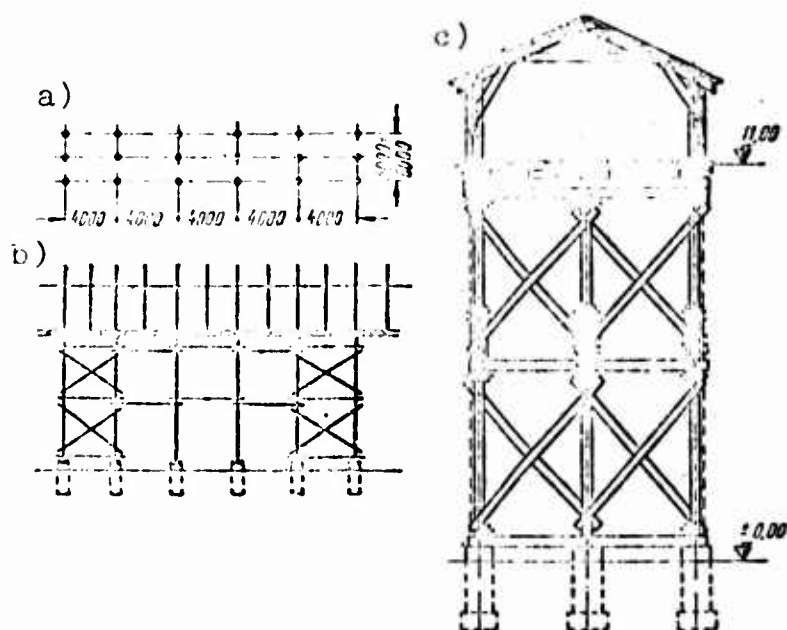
A haulage gallery with wooden support structures: a) the plan of the uprights; b) longitudinal section cut; c) transverse section.
